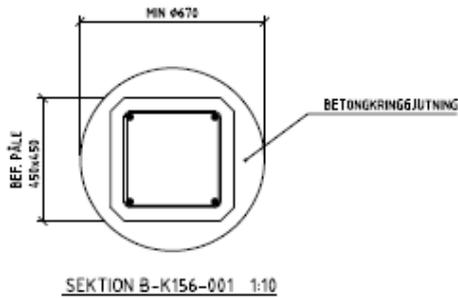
Cross-section of the original pile and the pile jacket<sup>7</sup>
